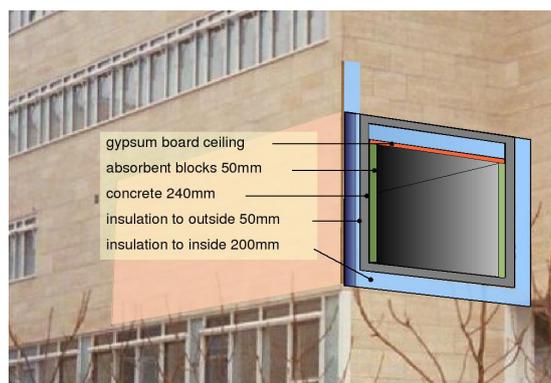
A schematic cutaway drawing of the archive. Notice the thin insulation to the outside and the thick insulation towards the warm building interior.
